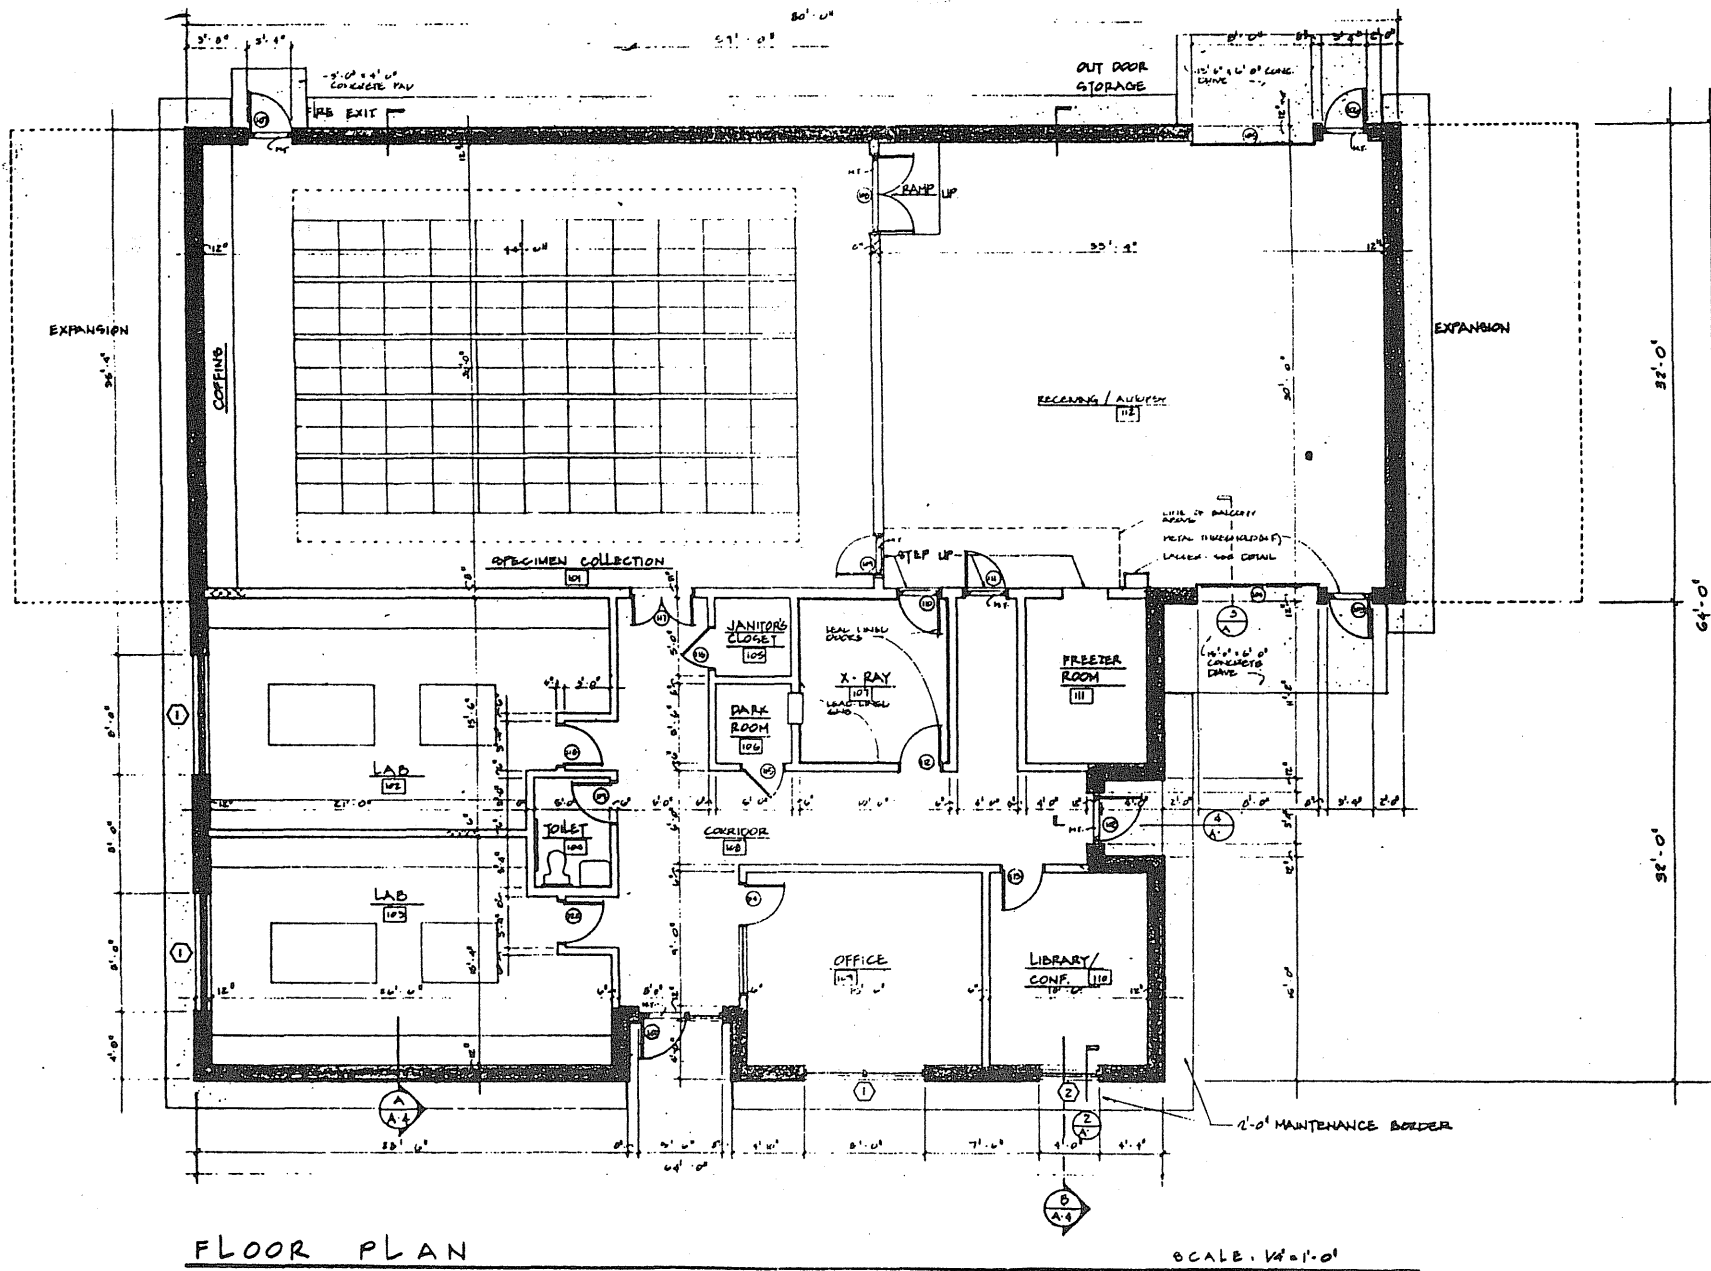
Floor Plan of New Vertebrate Ecology and Systematics Facility
